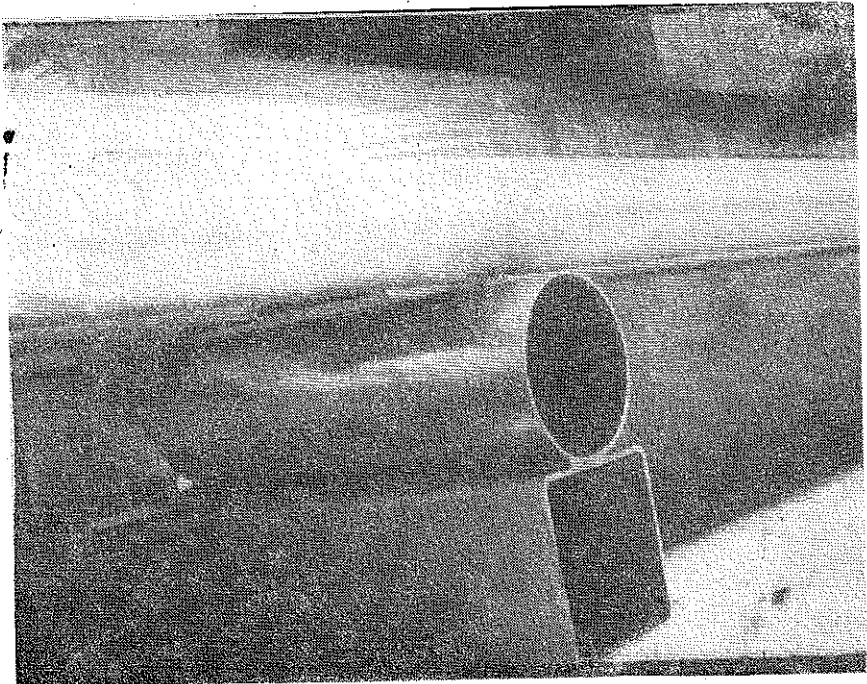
Close-up of energy absorbing tube element in modified bridge rail system.
